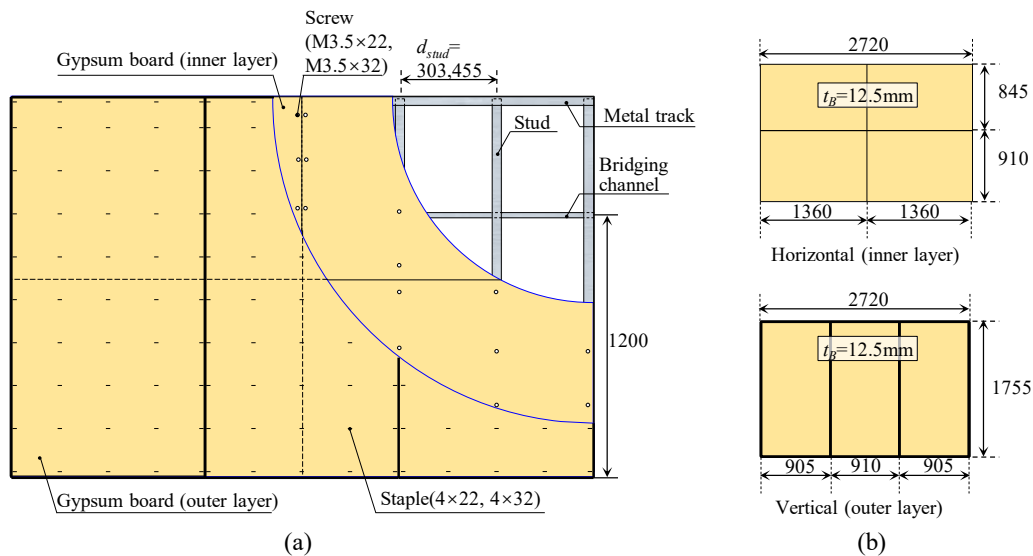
Specimen: (a) outline of specimen, (b) arrangement of gypsum board (Unit:mm).
